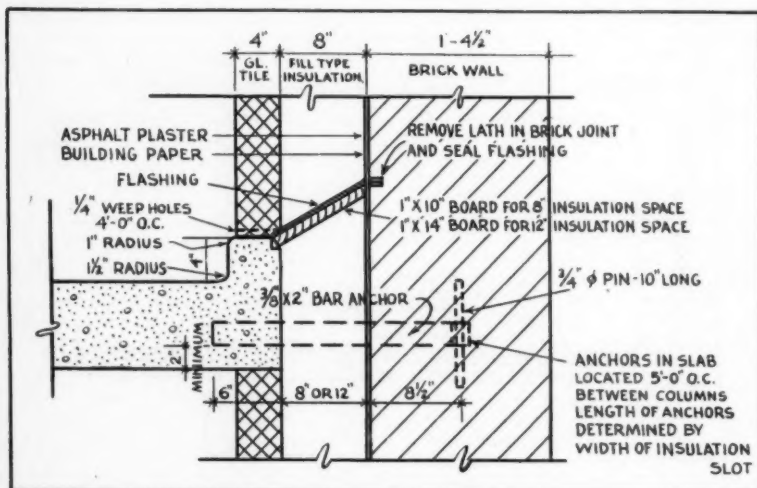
TYPICAL CONSTRUCTION USING FILL TYPE INSULATION.
